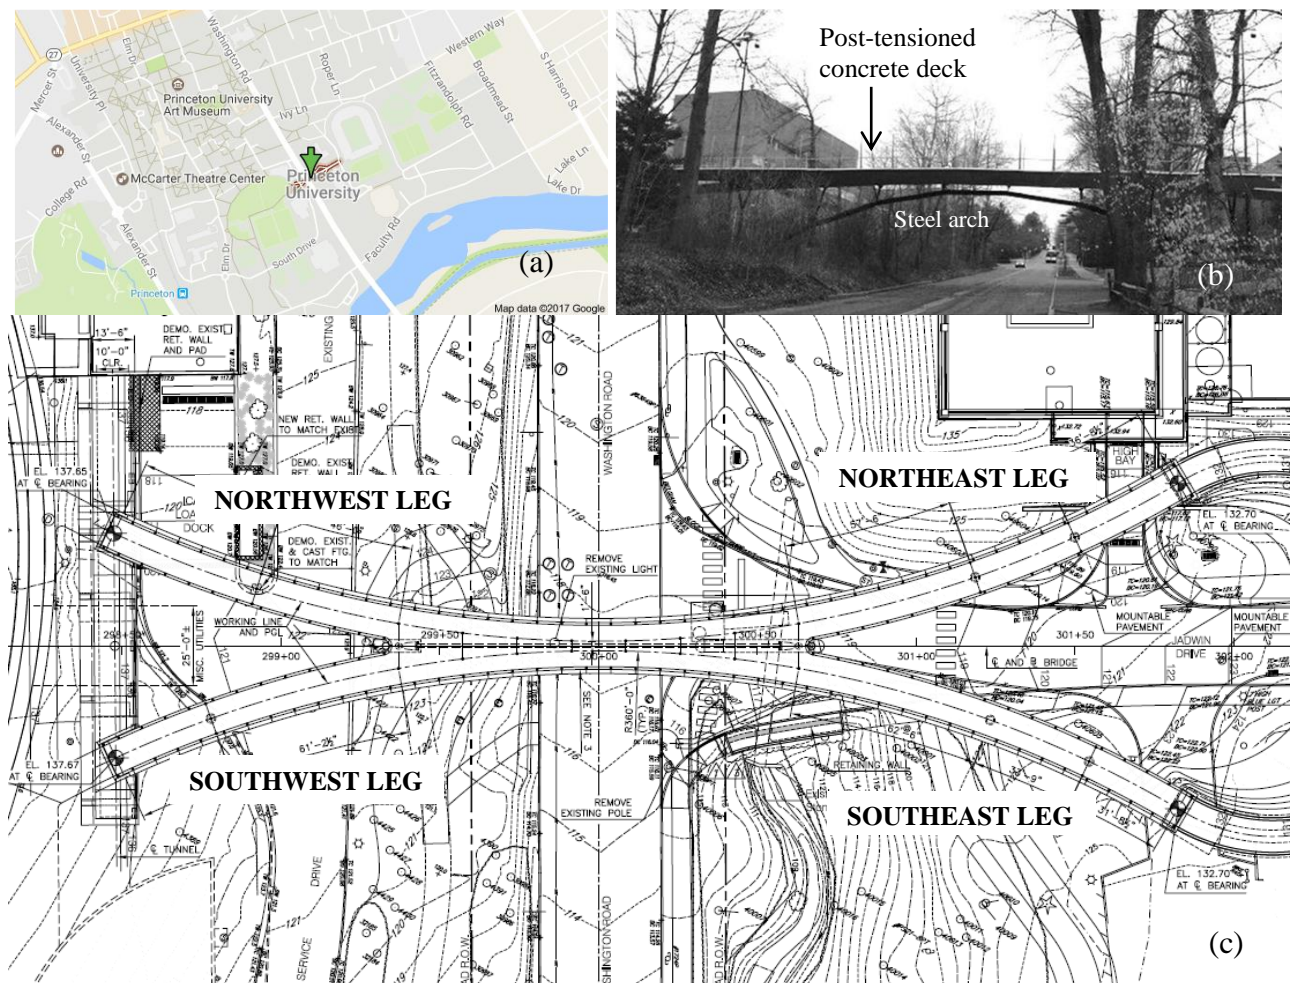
Streicker Bridge at the Princeton University: (a) location in the Campus, (b) image from Washington Road, (c) top view.
